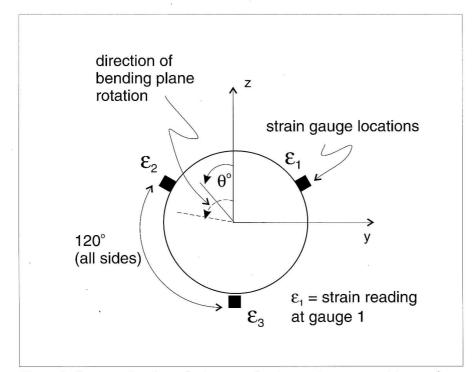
Cross-section through pipe strut showing strain gauge positions and direction of bending plane through strut.
